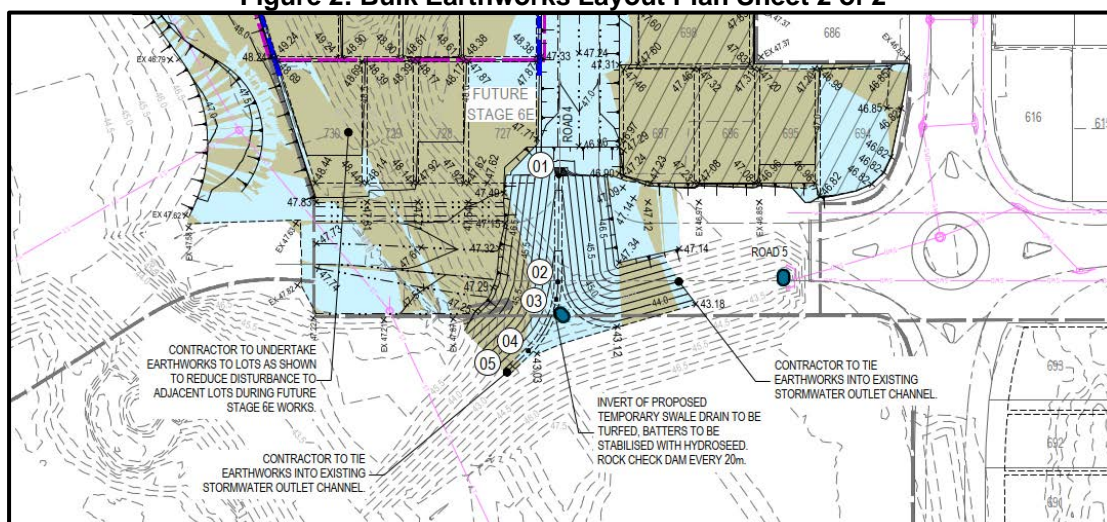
Bulk Earthworks Layout Plan Sheet 2 of 2
